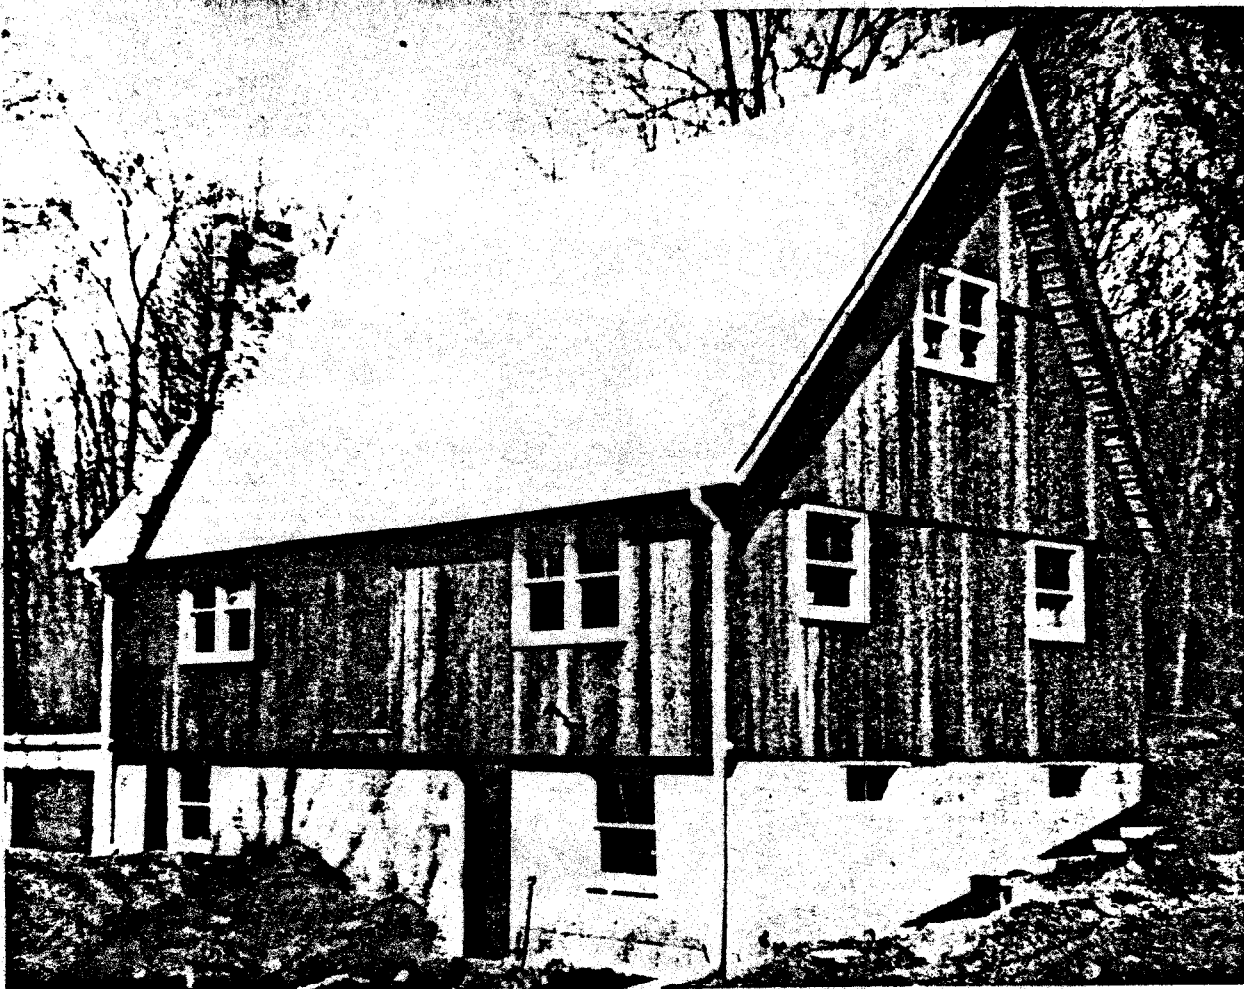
Five-bedroom house on full basement from plan FS-FF'L-2. Total cost of the house, inclusive of double garage, fireplace, and two baths, was 815,000.
